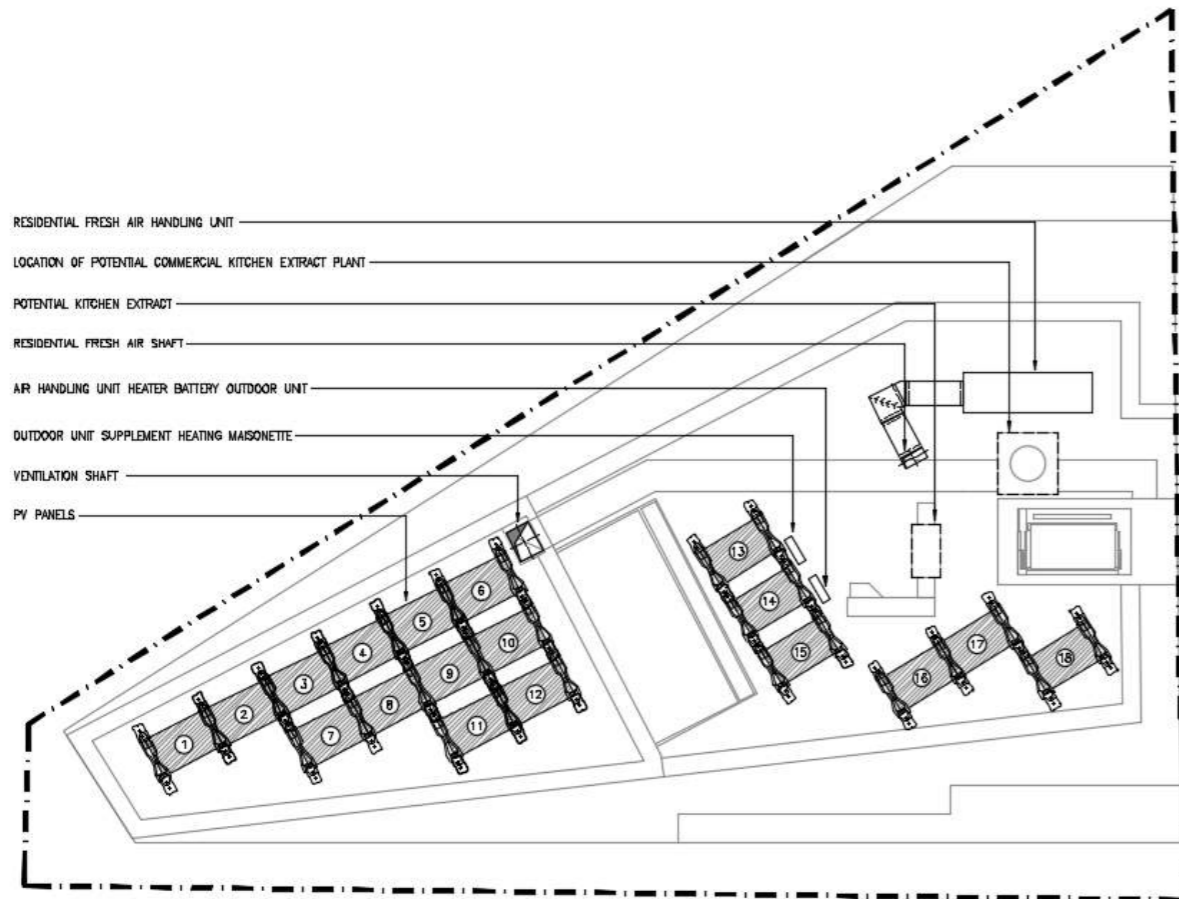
Proposed Plan of Roof layout showing location of PV panels
